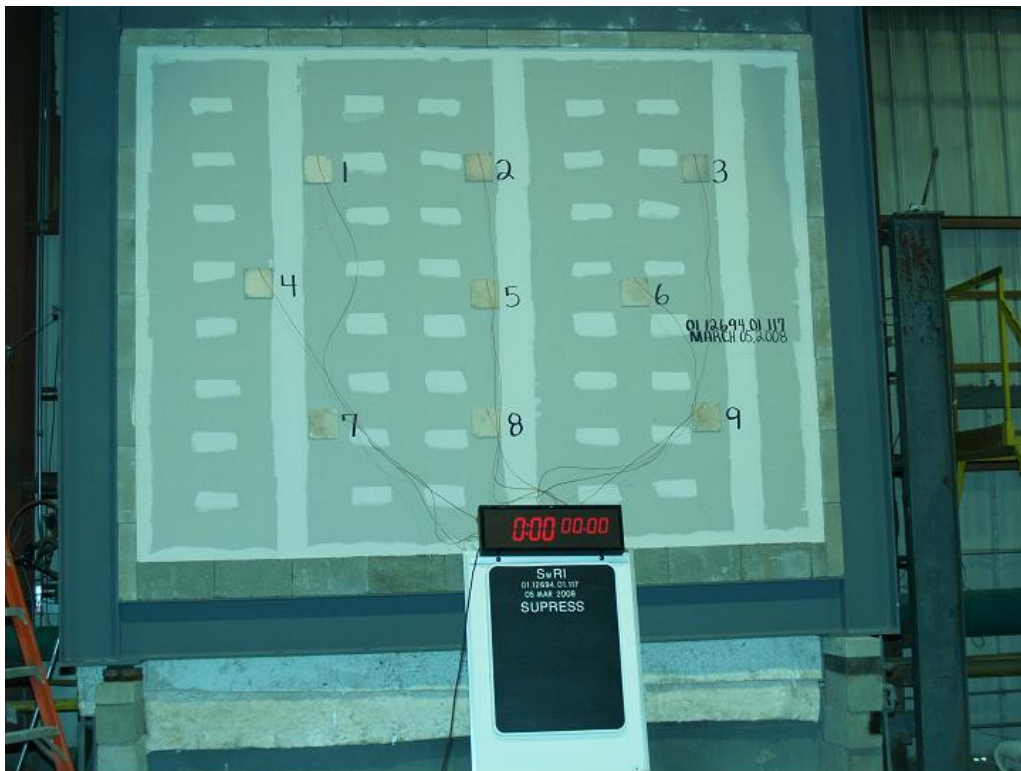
Unexposed Face of Fire Test Wall prior to Start of Furnace Exposure.
